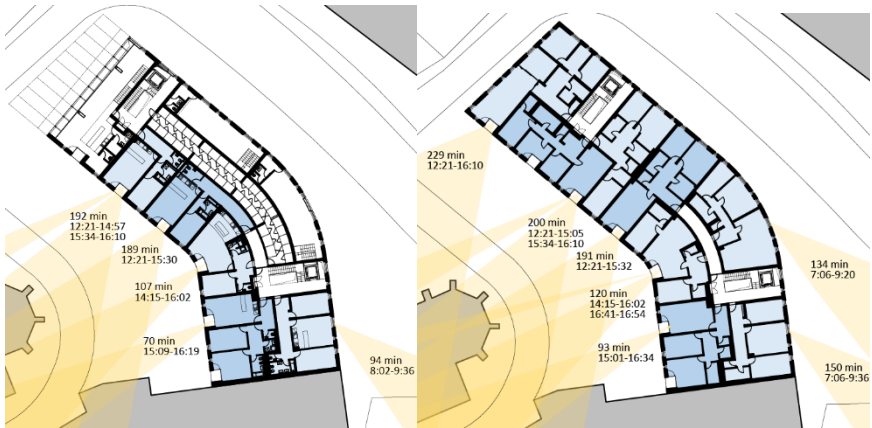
Apartment House Ostravská Brána sunlight in apartments on upper 1st floor (left) and 3rd floor (right) in urban context (1:1000) (source: author)
